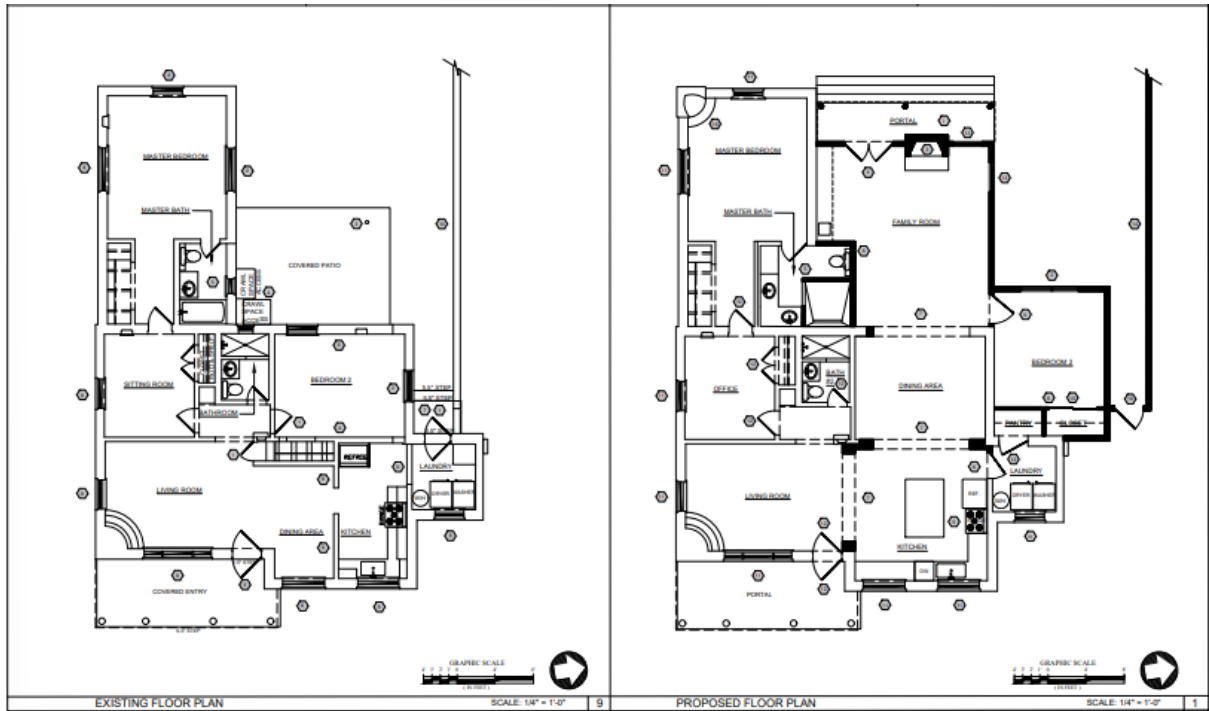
Existing and Proposed Floor Plan for the main residential structure.
